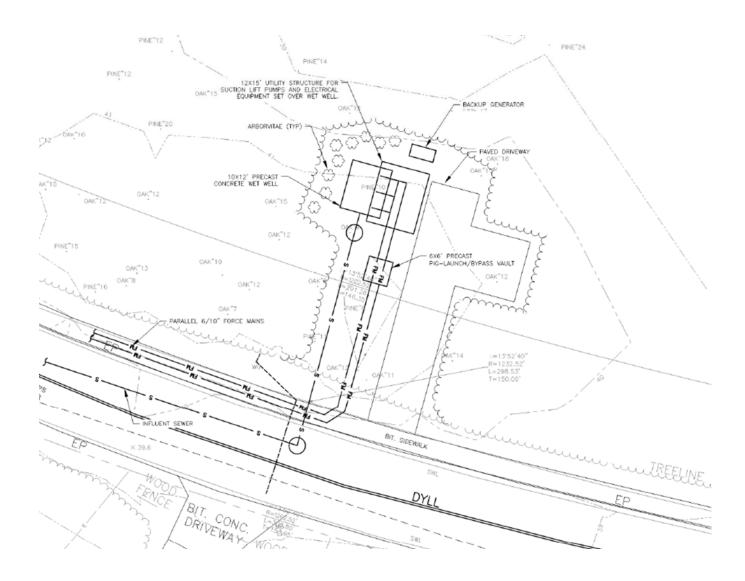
EXHIBIT BPROPOSED LOCATION OF SEWER PUMP STATION AT CAPE COD COLLABORATIVE PROPERTY
